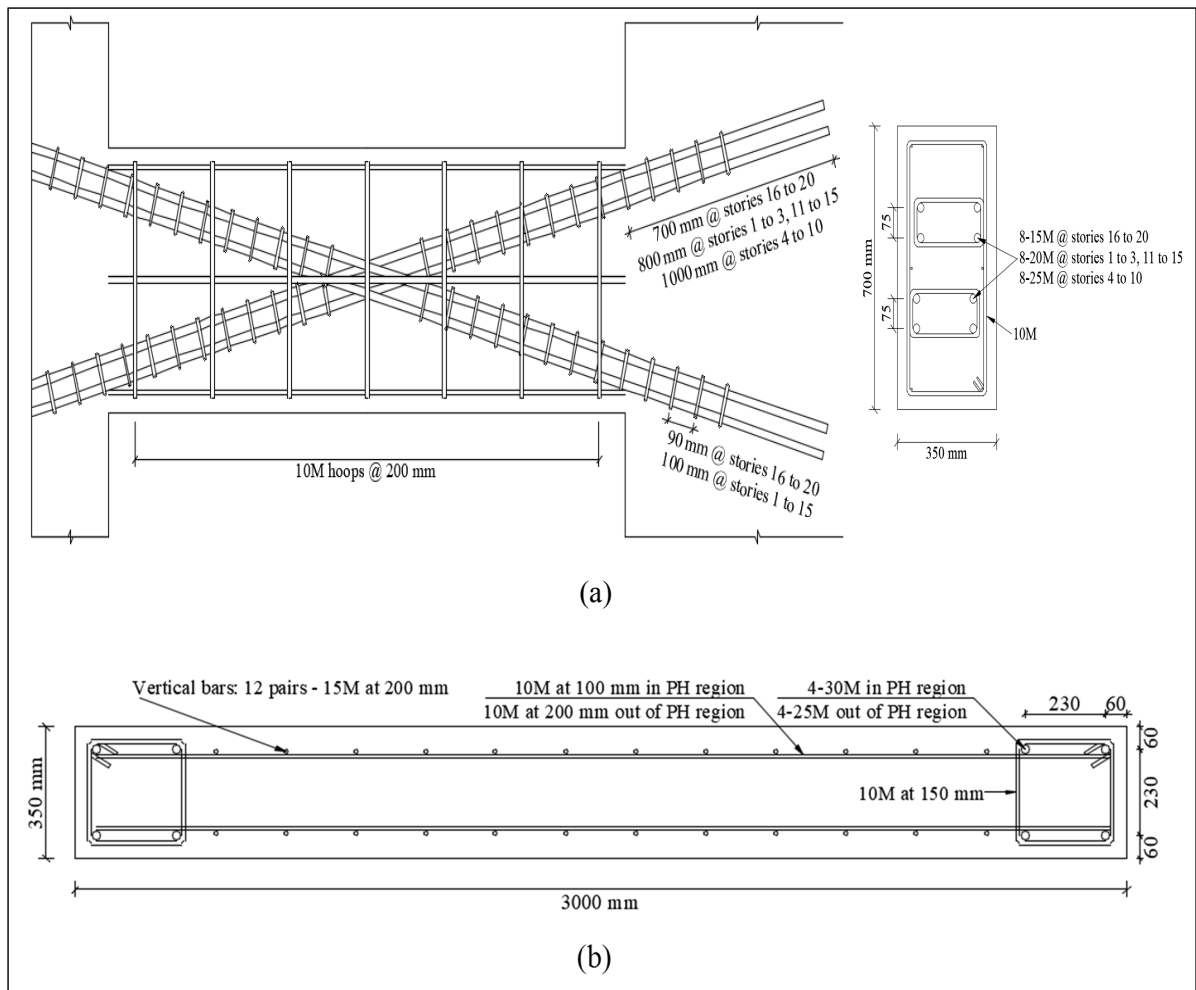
Design summary of CSW2015: (a) Reinforcement details of conventionally reinforced CBs, (b) Reinforcement details of one wall
